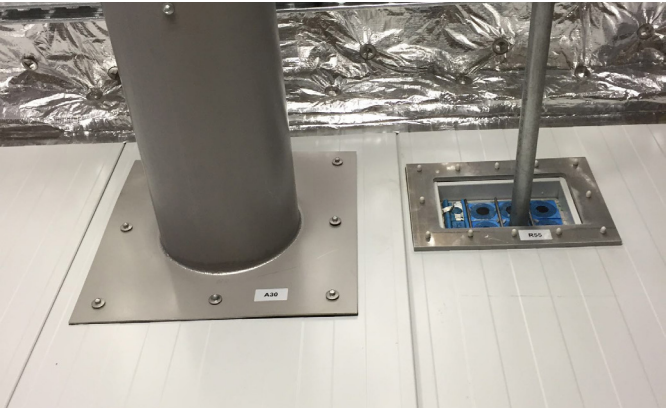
Pipe penetrations in Generation IV sandwich panel wall system. Seen from inside.
